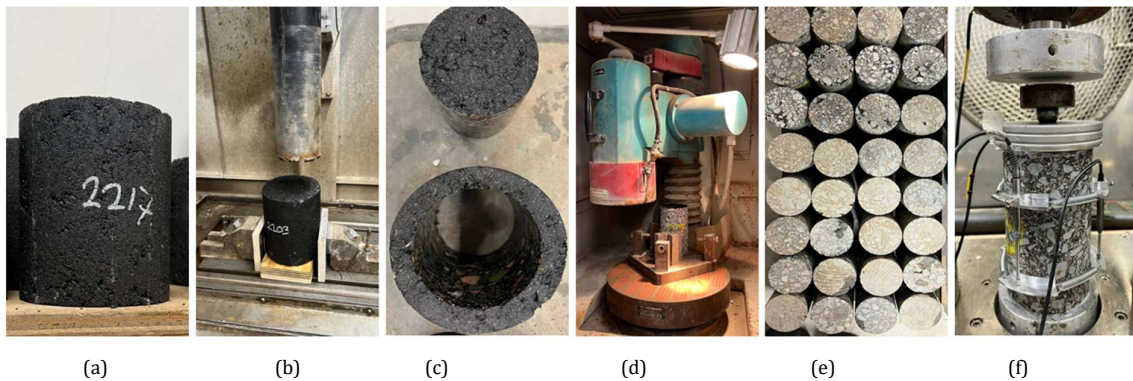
Specimen: (a) as received from Dura Vermeer (b) mounted in core cutter at TU Delft lab (c) after cored out (d) mounted in polishing machine (e) after coring and polishing (f) mounted in the hydraulic testing machine ready for stiffness testing.
